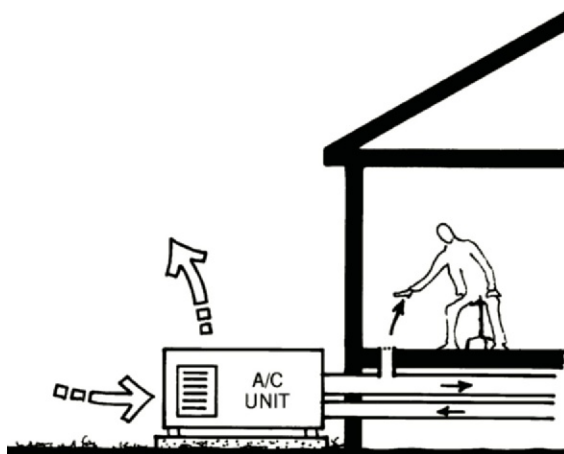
A packaged unit designed for crawl-space construction is shown.
